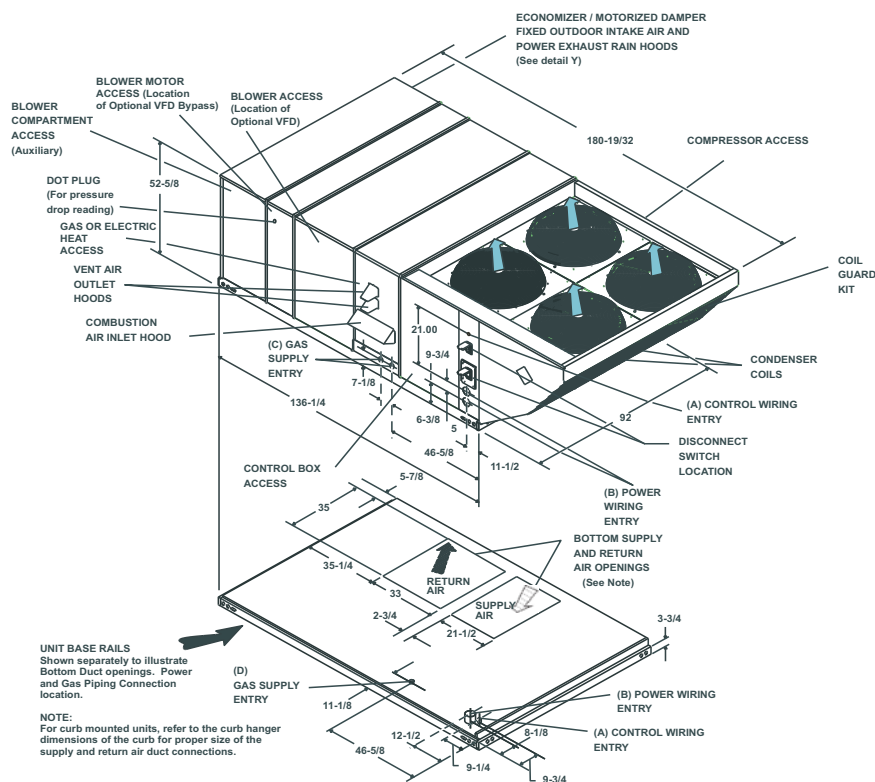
J15 thru 25 ZR Unit Dimensions Front View
